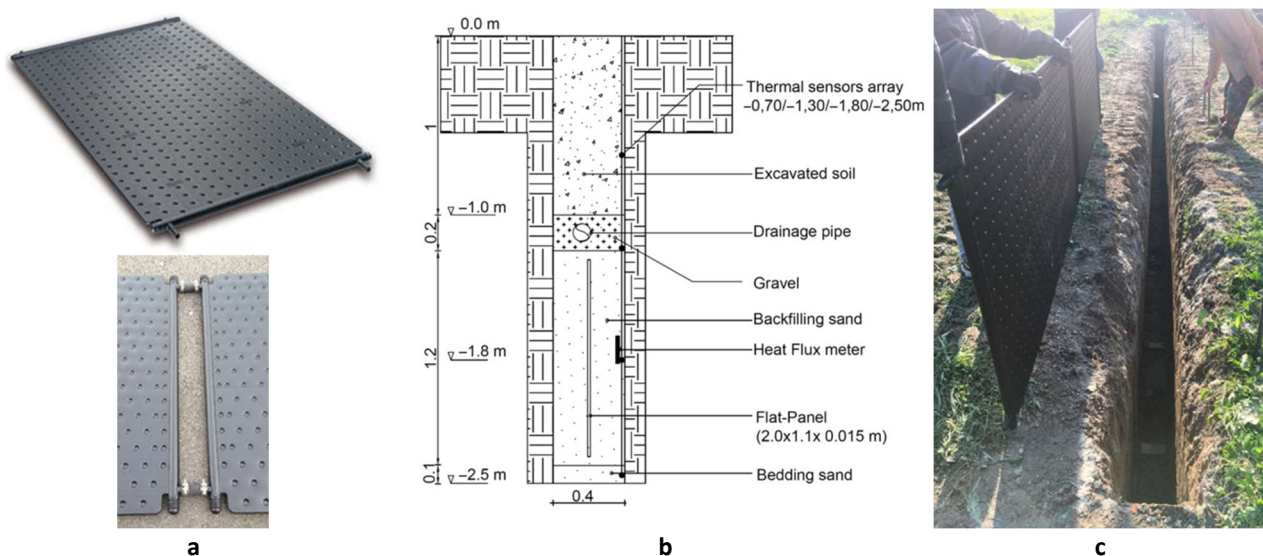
View of the flat panel with detail of hydraulic connections (a); cross section of the trench (b); installation in trench (c) [25].
